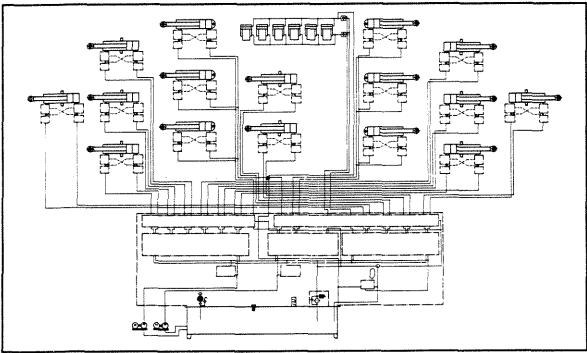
Shuaiba Maqal road bridge, hydraulic locking system
